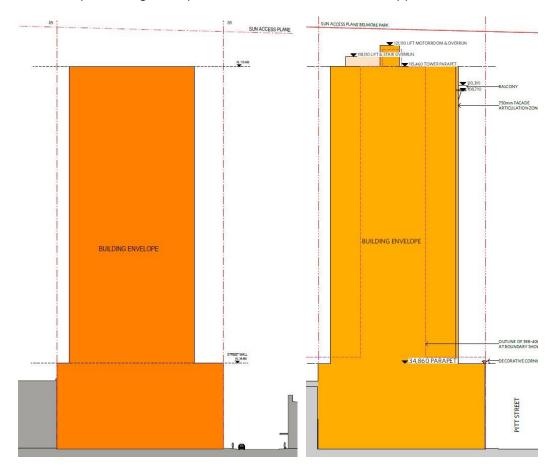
Approved concept building envelope east west section (left), and as lodged to be modified in D/2015/661/B (right)
